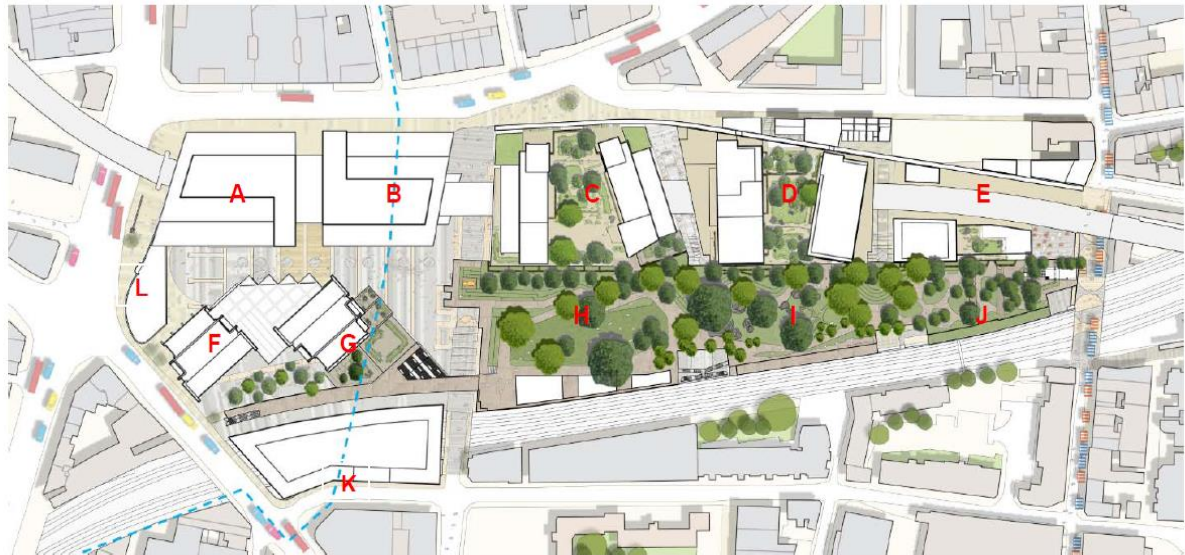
Final Illustrative Masterplan for the 2015 Proposed Development – First Floor
